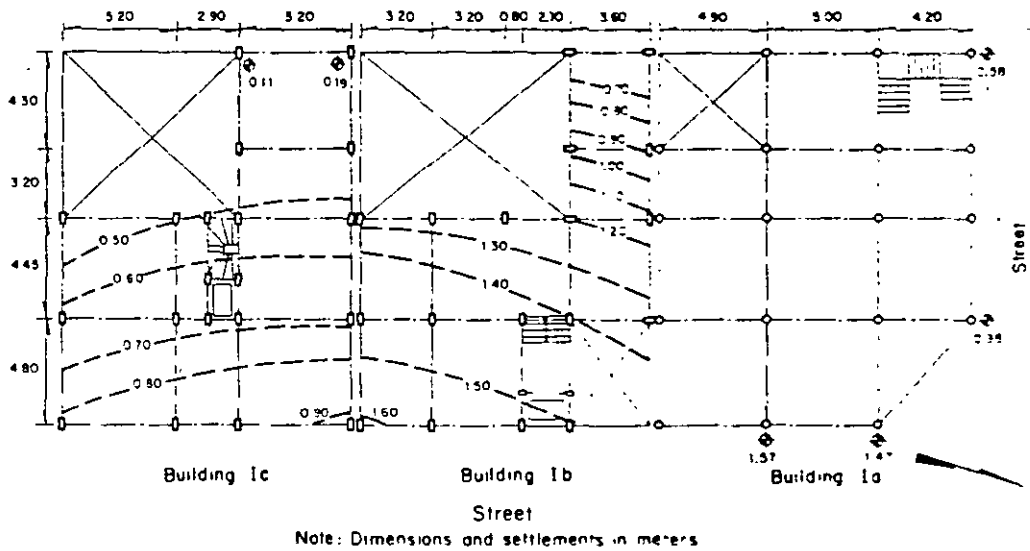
Plan and outline of settlements in three buildings on mat foundation.
